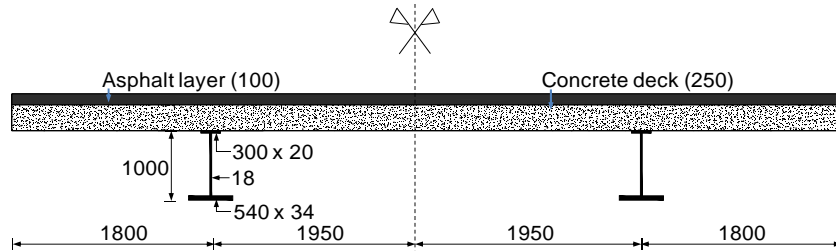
Cross section of a 25 m RC bridge (dimensions in mm)
